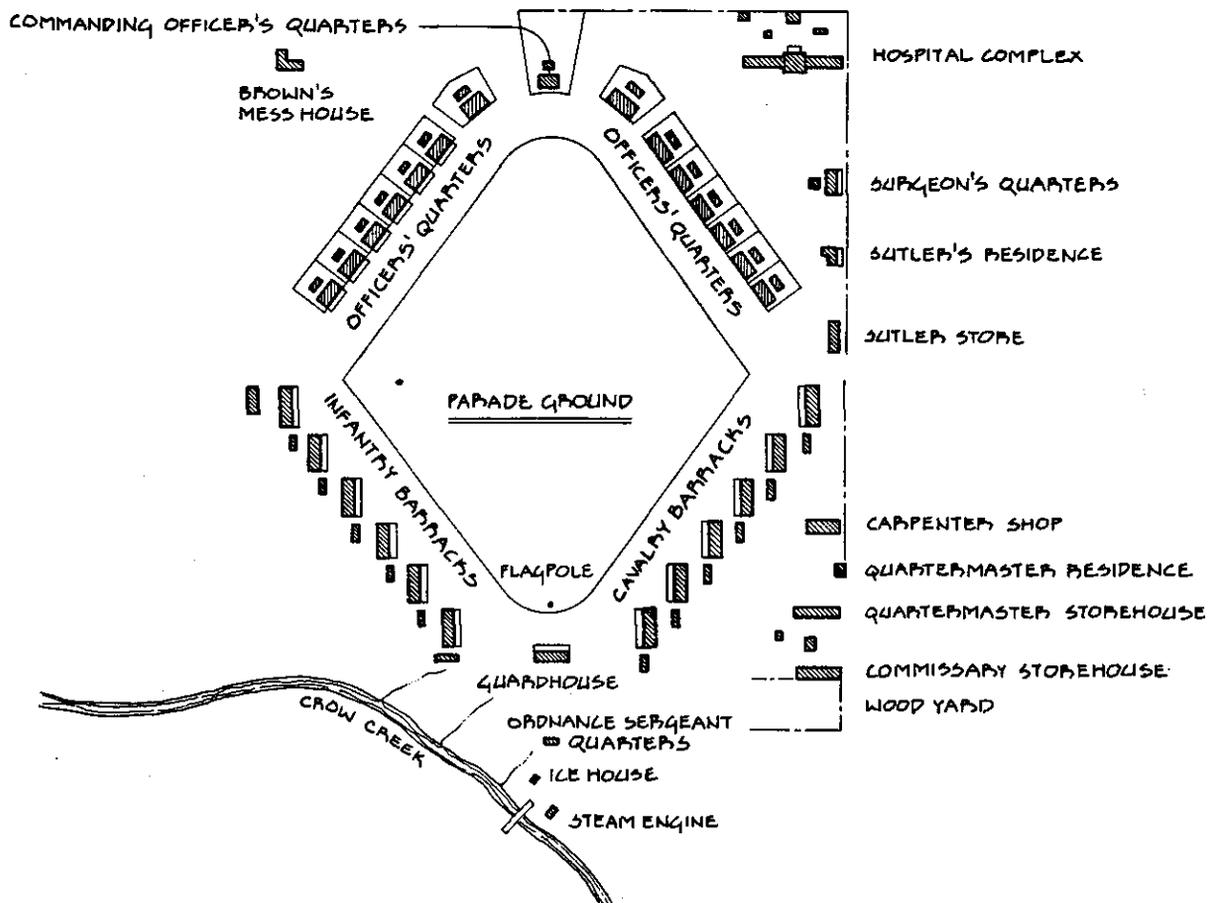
Site Plan at Fort D.A. Russell, 1867, from plan by C.H. Alden
